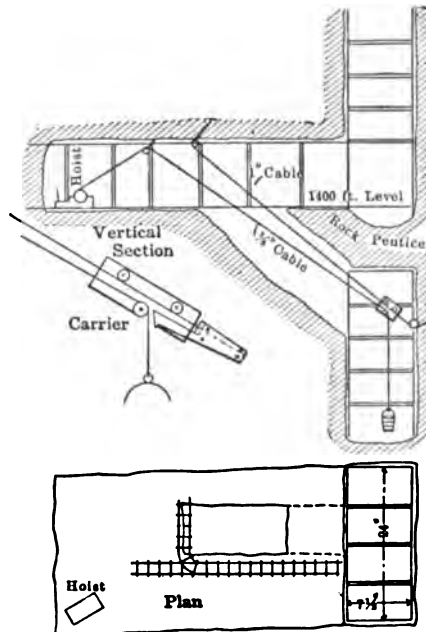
SHAFT SINKING UNDER ROCK PENTICE, PIONEER MINE.
